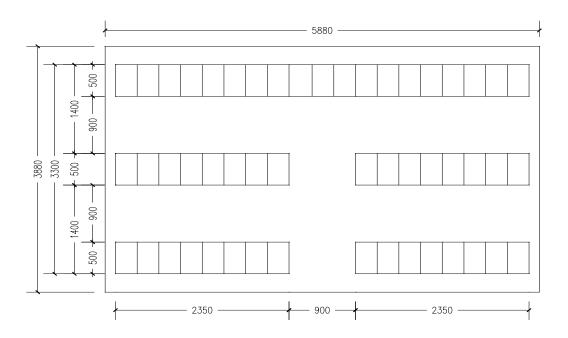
Storage chamber floor plan showing arrangement of crates
